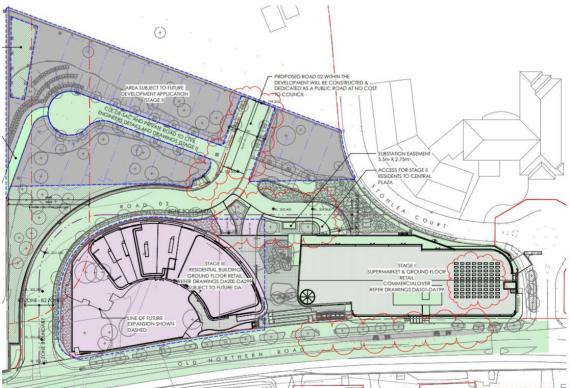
DA 979/2016/HB - Site Plan (Source: Leffler Simes Architects)
